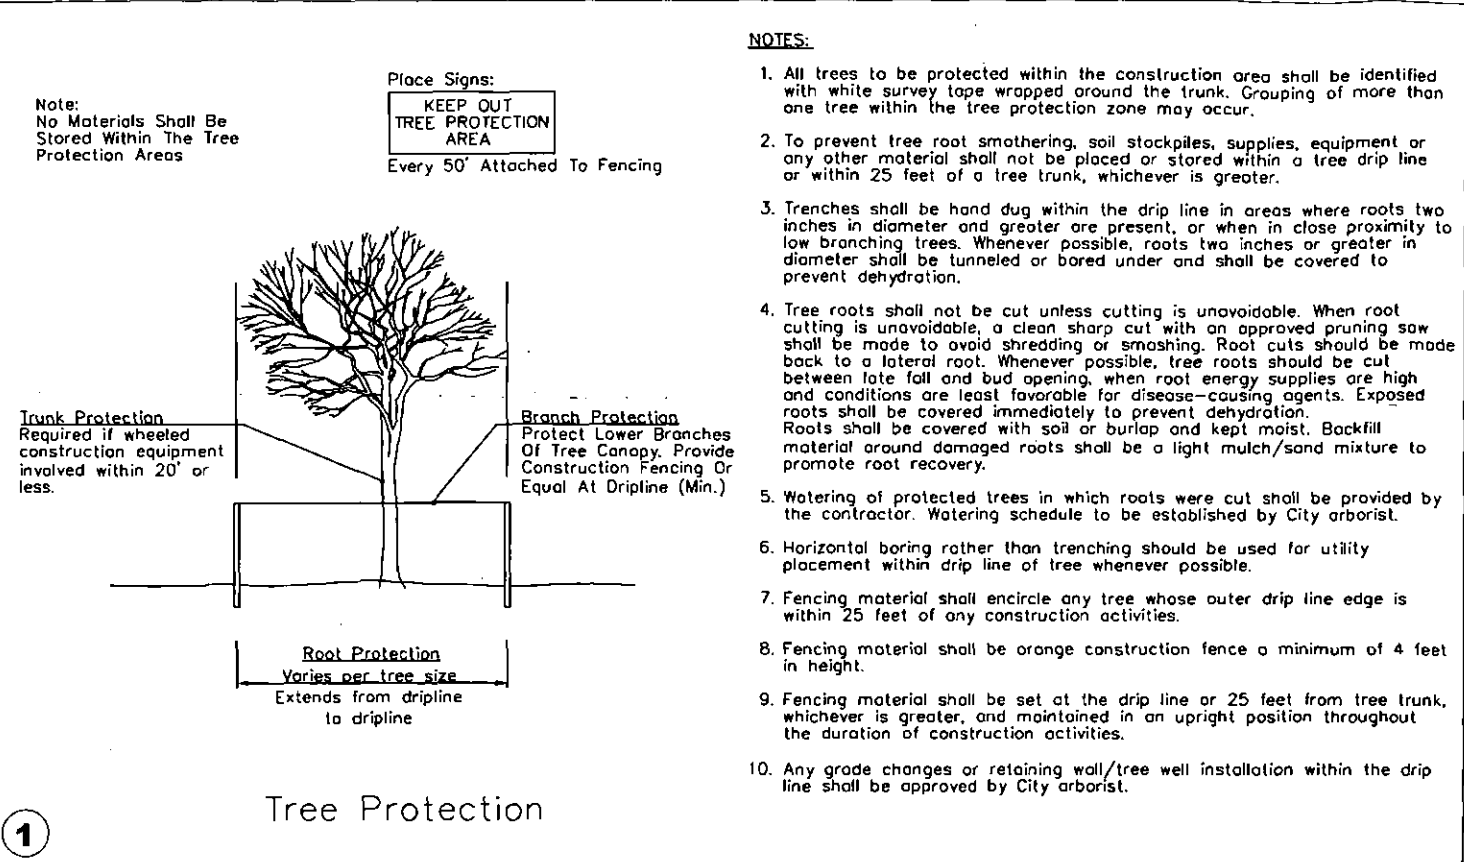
City of Scottsdale Standard Details
